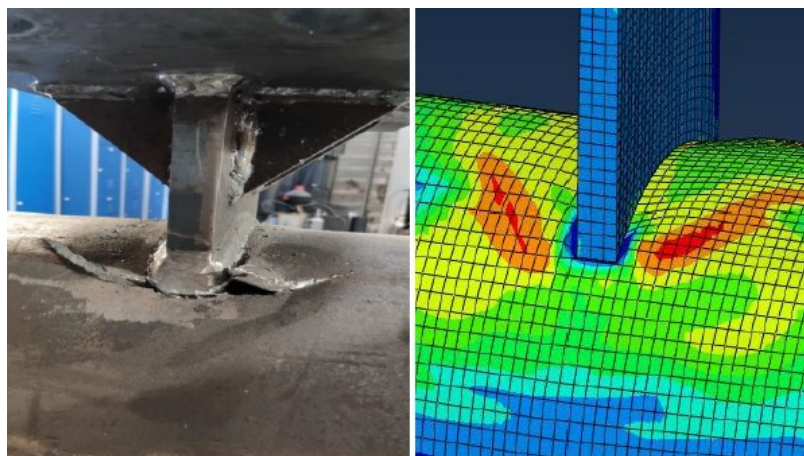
Deformed configuration of the tube (numerical model referred to the first tested specimen)
